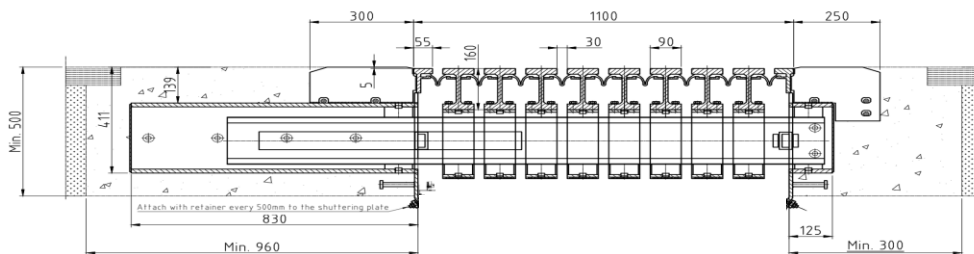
Typical cross section of a nine-gap Tensa-Modular expansion joint as installed
